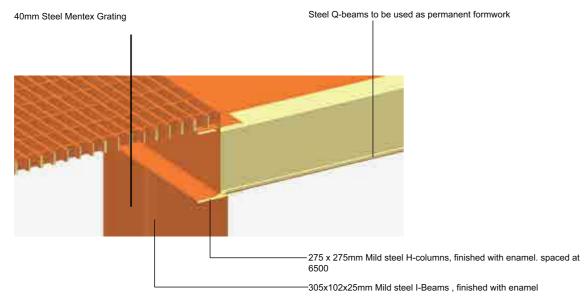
Typical detail section cutting through walkways and Mentex Grating
